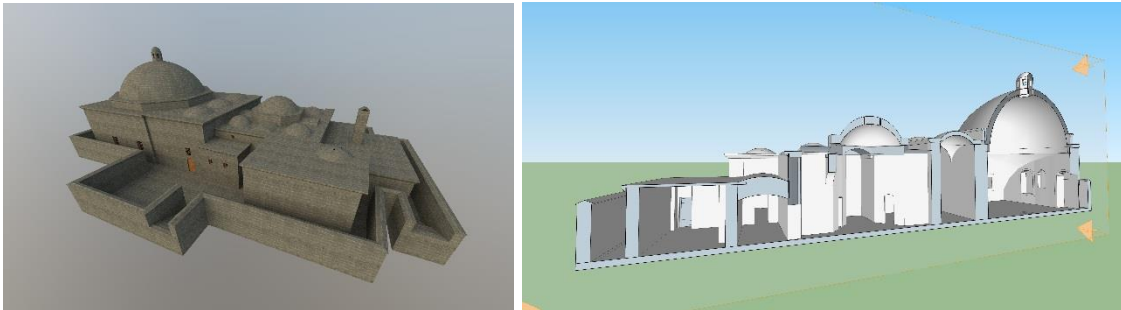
(a), (b) Setenönü Hamamı 3D Drawings
